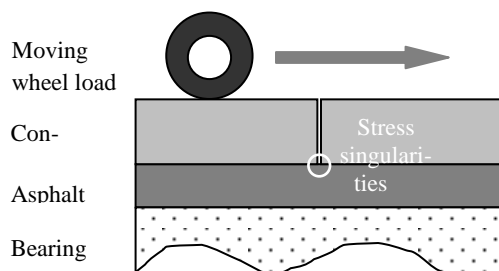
Example of stress singularities at the interface near a crack on a loaded composite pavement structure (Pouteau et al., 2004)
